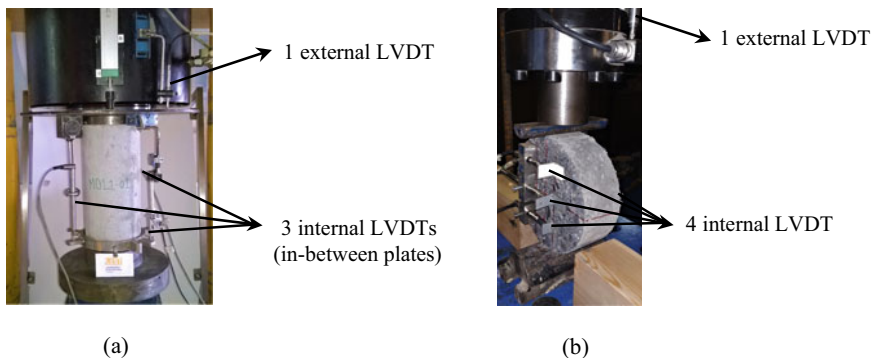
Experimental set-up: a uniaxial compression test; b tensile splitting test
